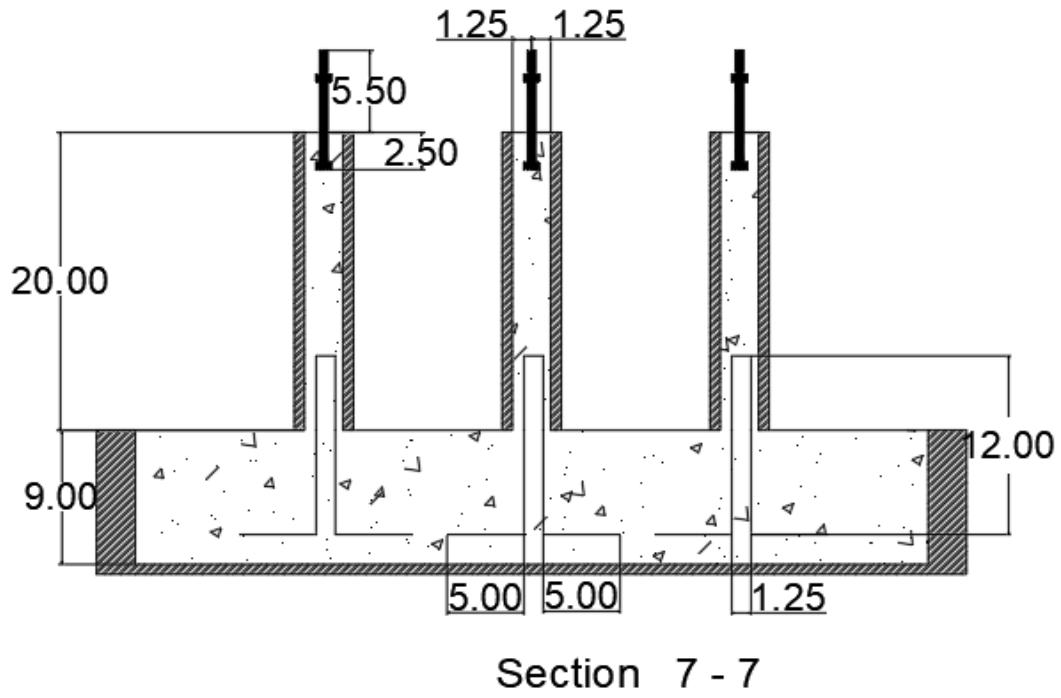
Specimen Sections (7-7), all dimensions in inch.
